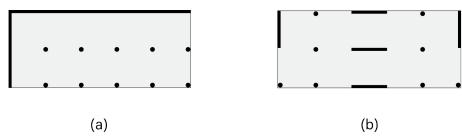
Two ground floor plans of buildings. In (a) earthquake force in each direction is resisted by a wall on the side of the building that is not symmetrical compared to the area of the building. This building will twist badly during an earthquake. In (b) the walls in each direction are located symmetrically. Twisting will be minimal.
